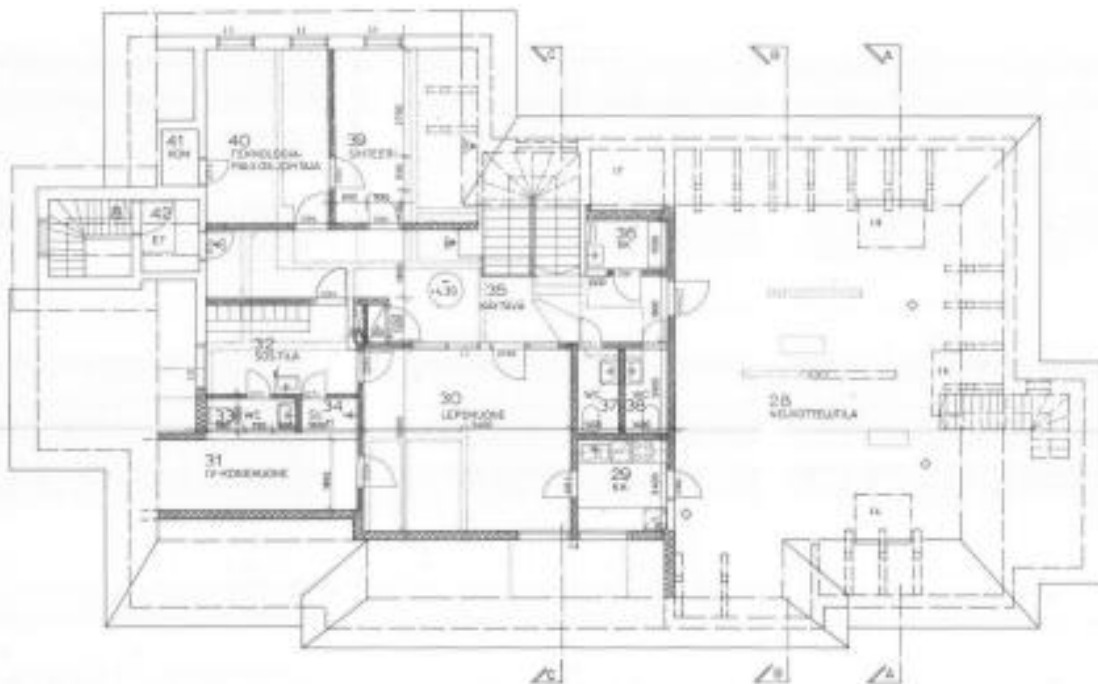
Floor plan and facilities of the second floor in the 90's renovation (not to scale)
